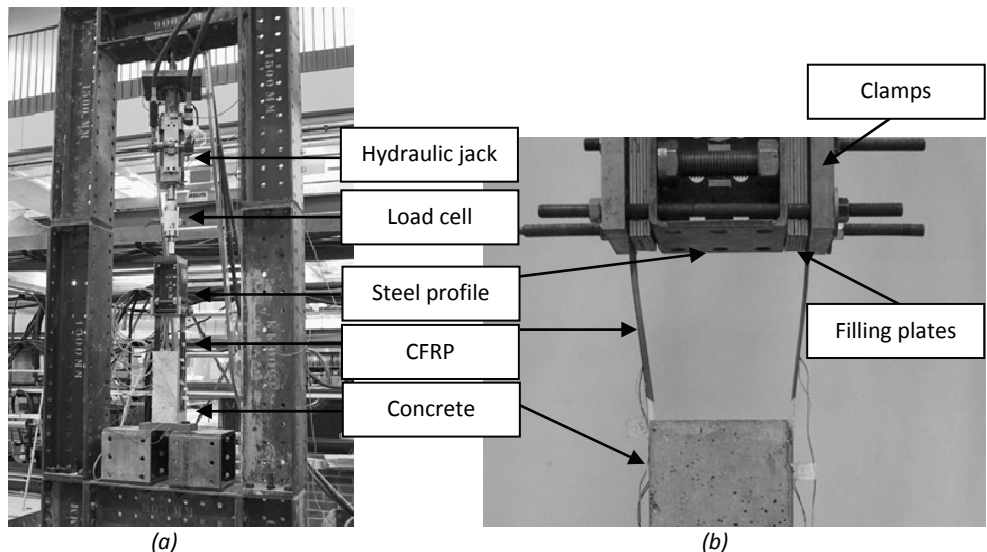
Test setup (a) and detail of the connection between the concrete specimen and the steel profile (b)
